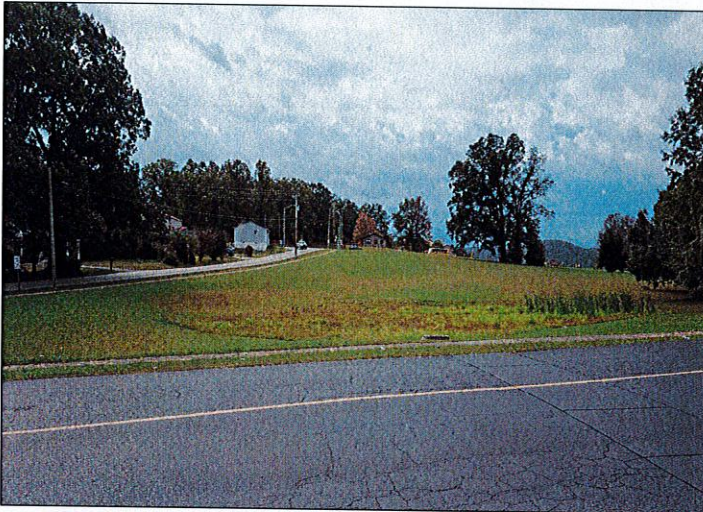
View of the proposed right of way and temporary easement, looking north from West College Avenue
